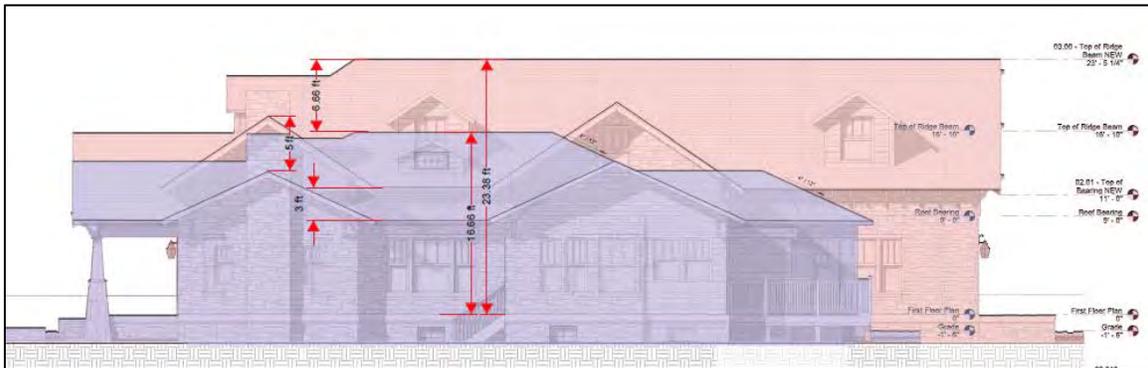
Right side elevations for existing (blue) and proposed (pink), illustrating the increase in first story wall height, roof pitch, and roof height.
